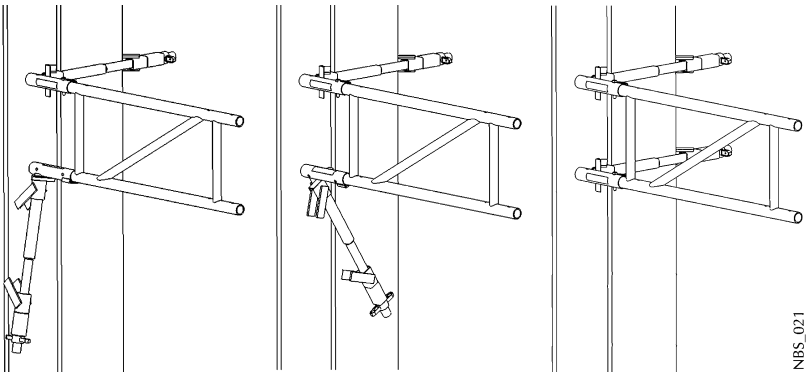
Mounting of Steel Jaw Clamp and Truss Beam
